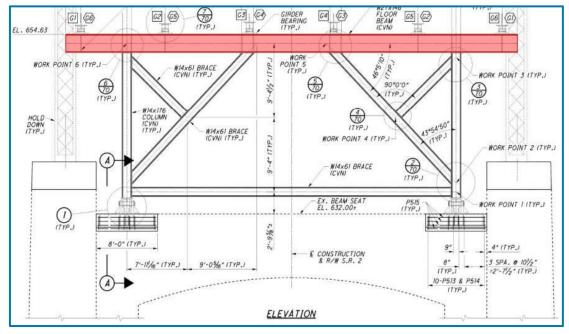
Typical steel bent (located at Pier B and Pier E). NSTMs are highlighted in red.
